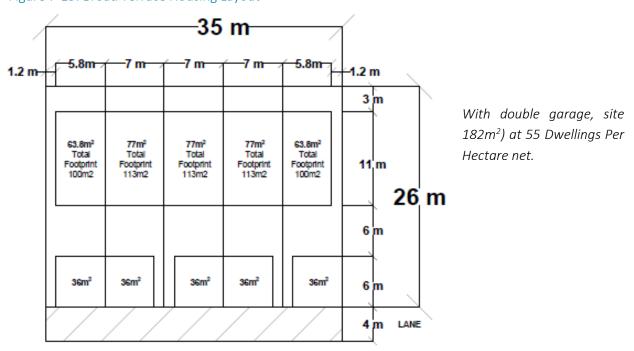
Townhouse layout at 55 Dwellings per hectare net.
